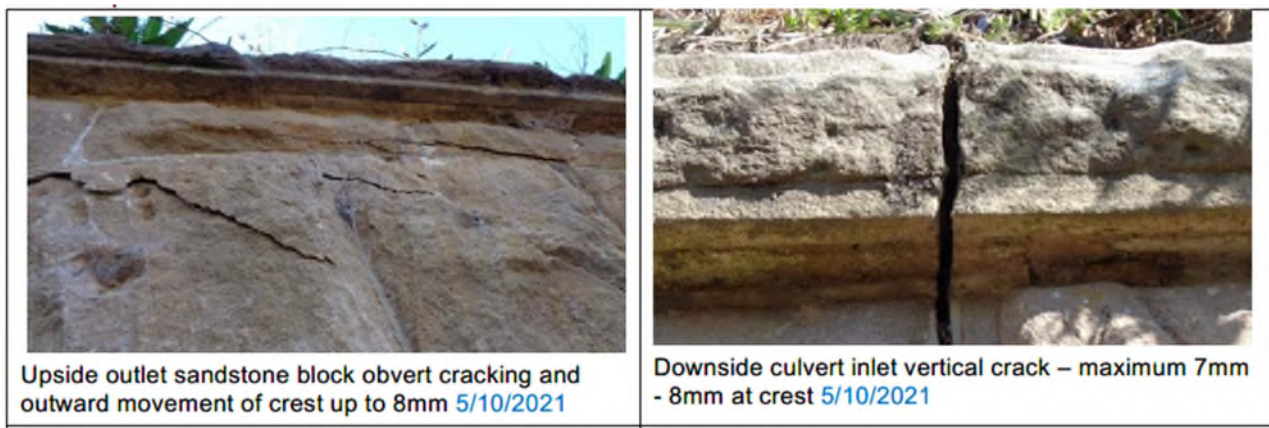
Cracking at culvert 88.44 km (source: LW W3 PMLL Detailed Monitoring Report 4, Appendix F).
